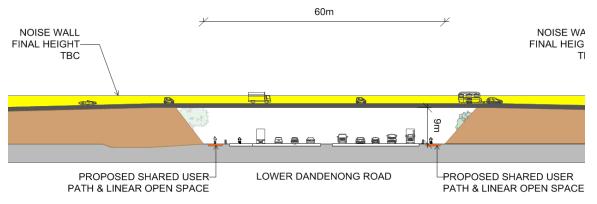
Cross section N Lower Dandenong Road overpass with standard mitigation
